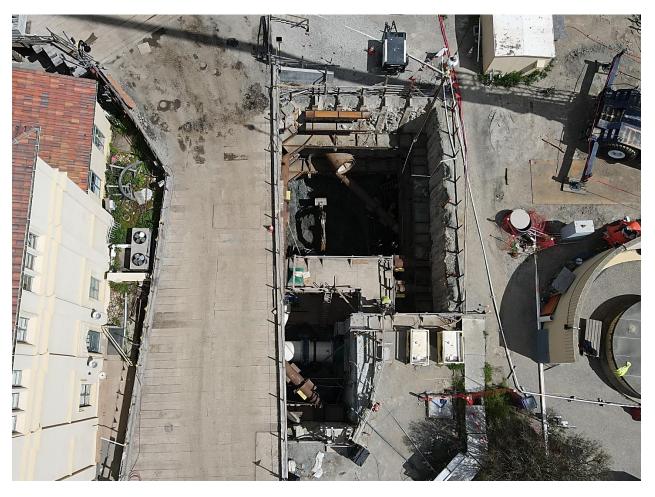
Aerial view of the Effluent 1 excavation pit with the temporary construction bridge to the left of the photo.
